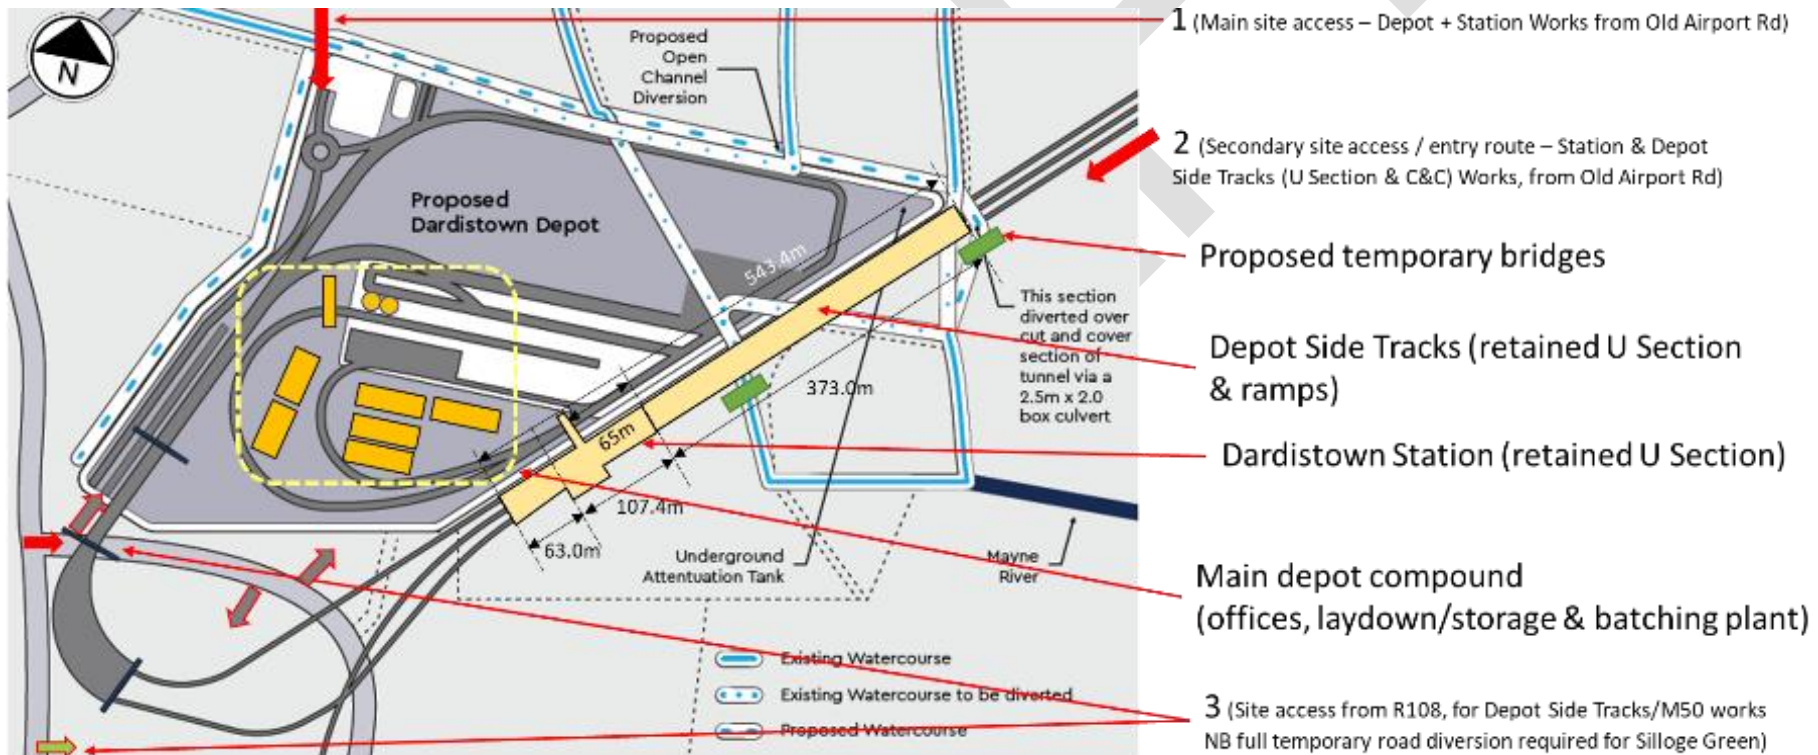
Dardistown Station Stage 1- Site Access & Compound
